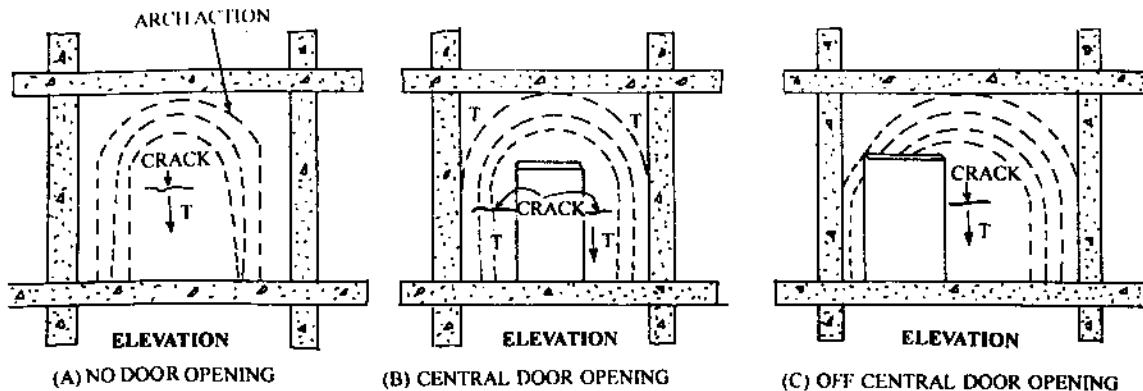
Cracking in partition wall supported on RCC slab beam
